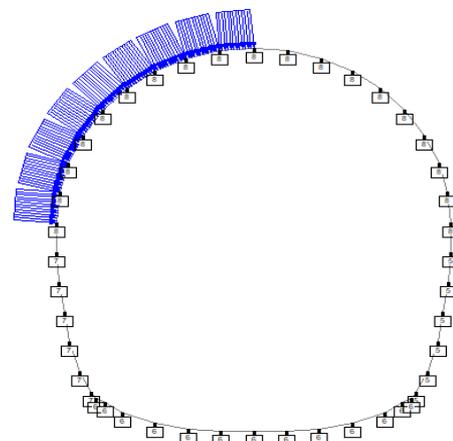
Grouting Pressure (Critical) on Concrete Lining
